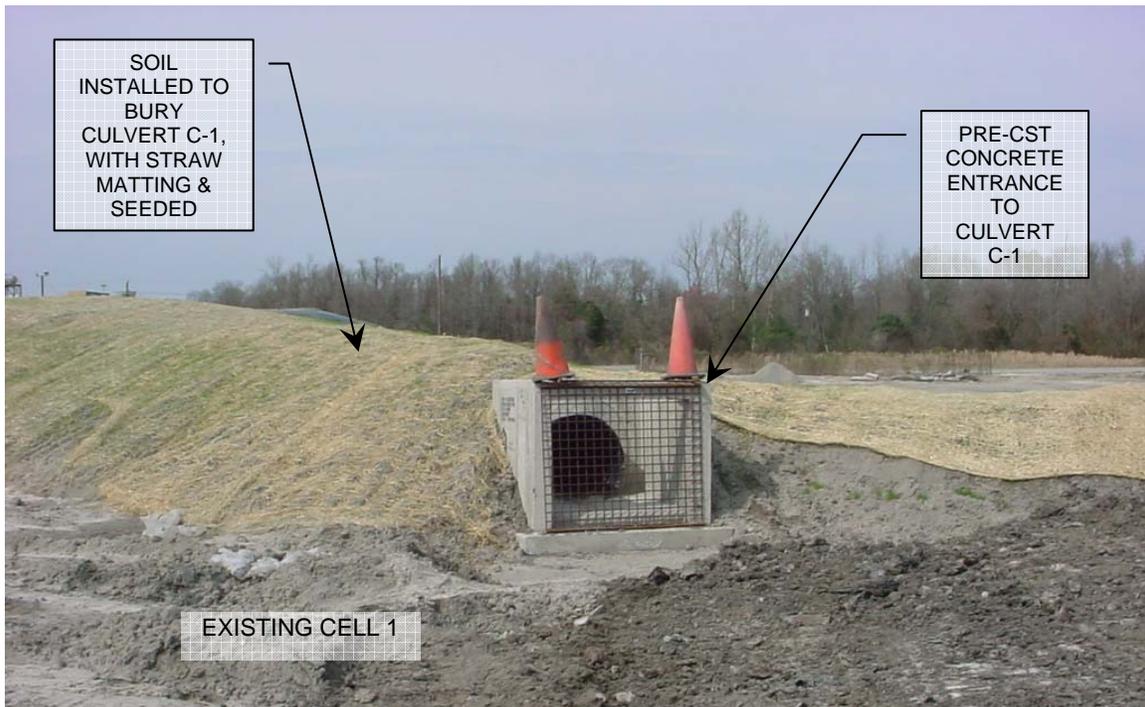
Culvert C-1 will allow storm water in Cell to gravity flow to the treatment system through to the waste water treatment system (3/12/2009).
